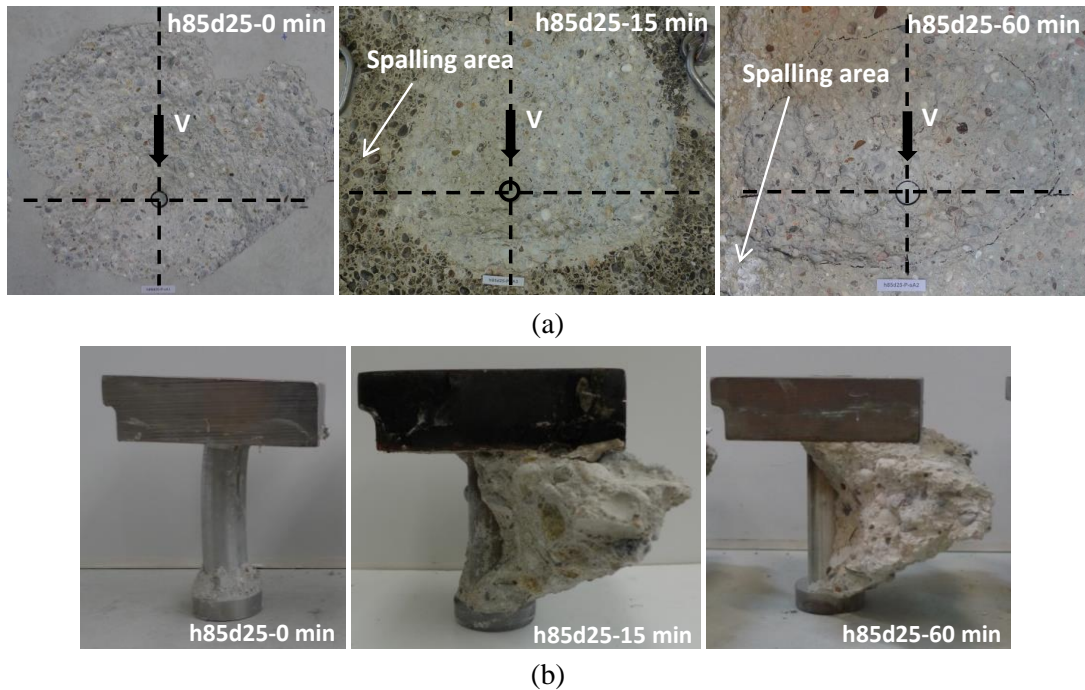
Failure patterns of pry-out tests after fire. (a) Concrete breakout; (b) anchor.
